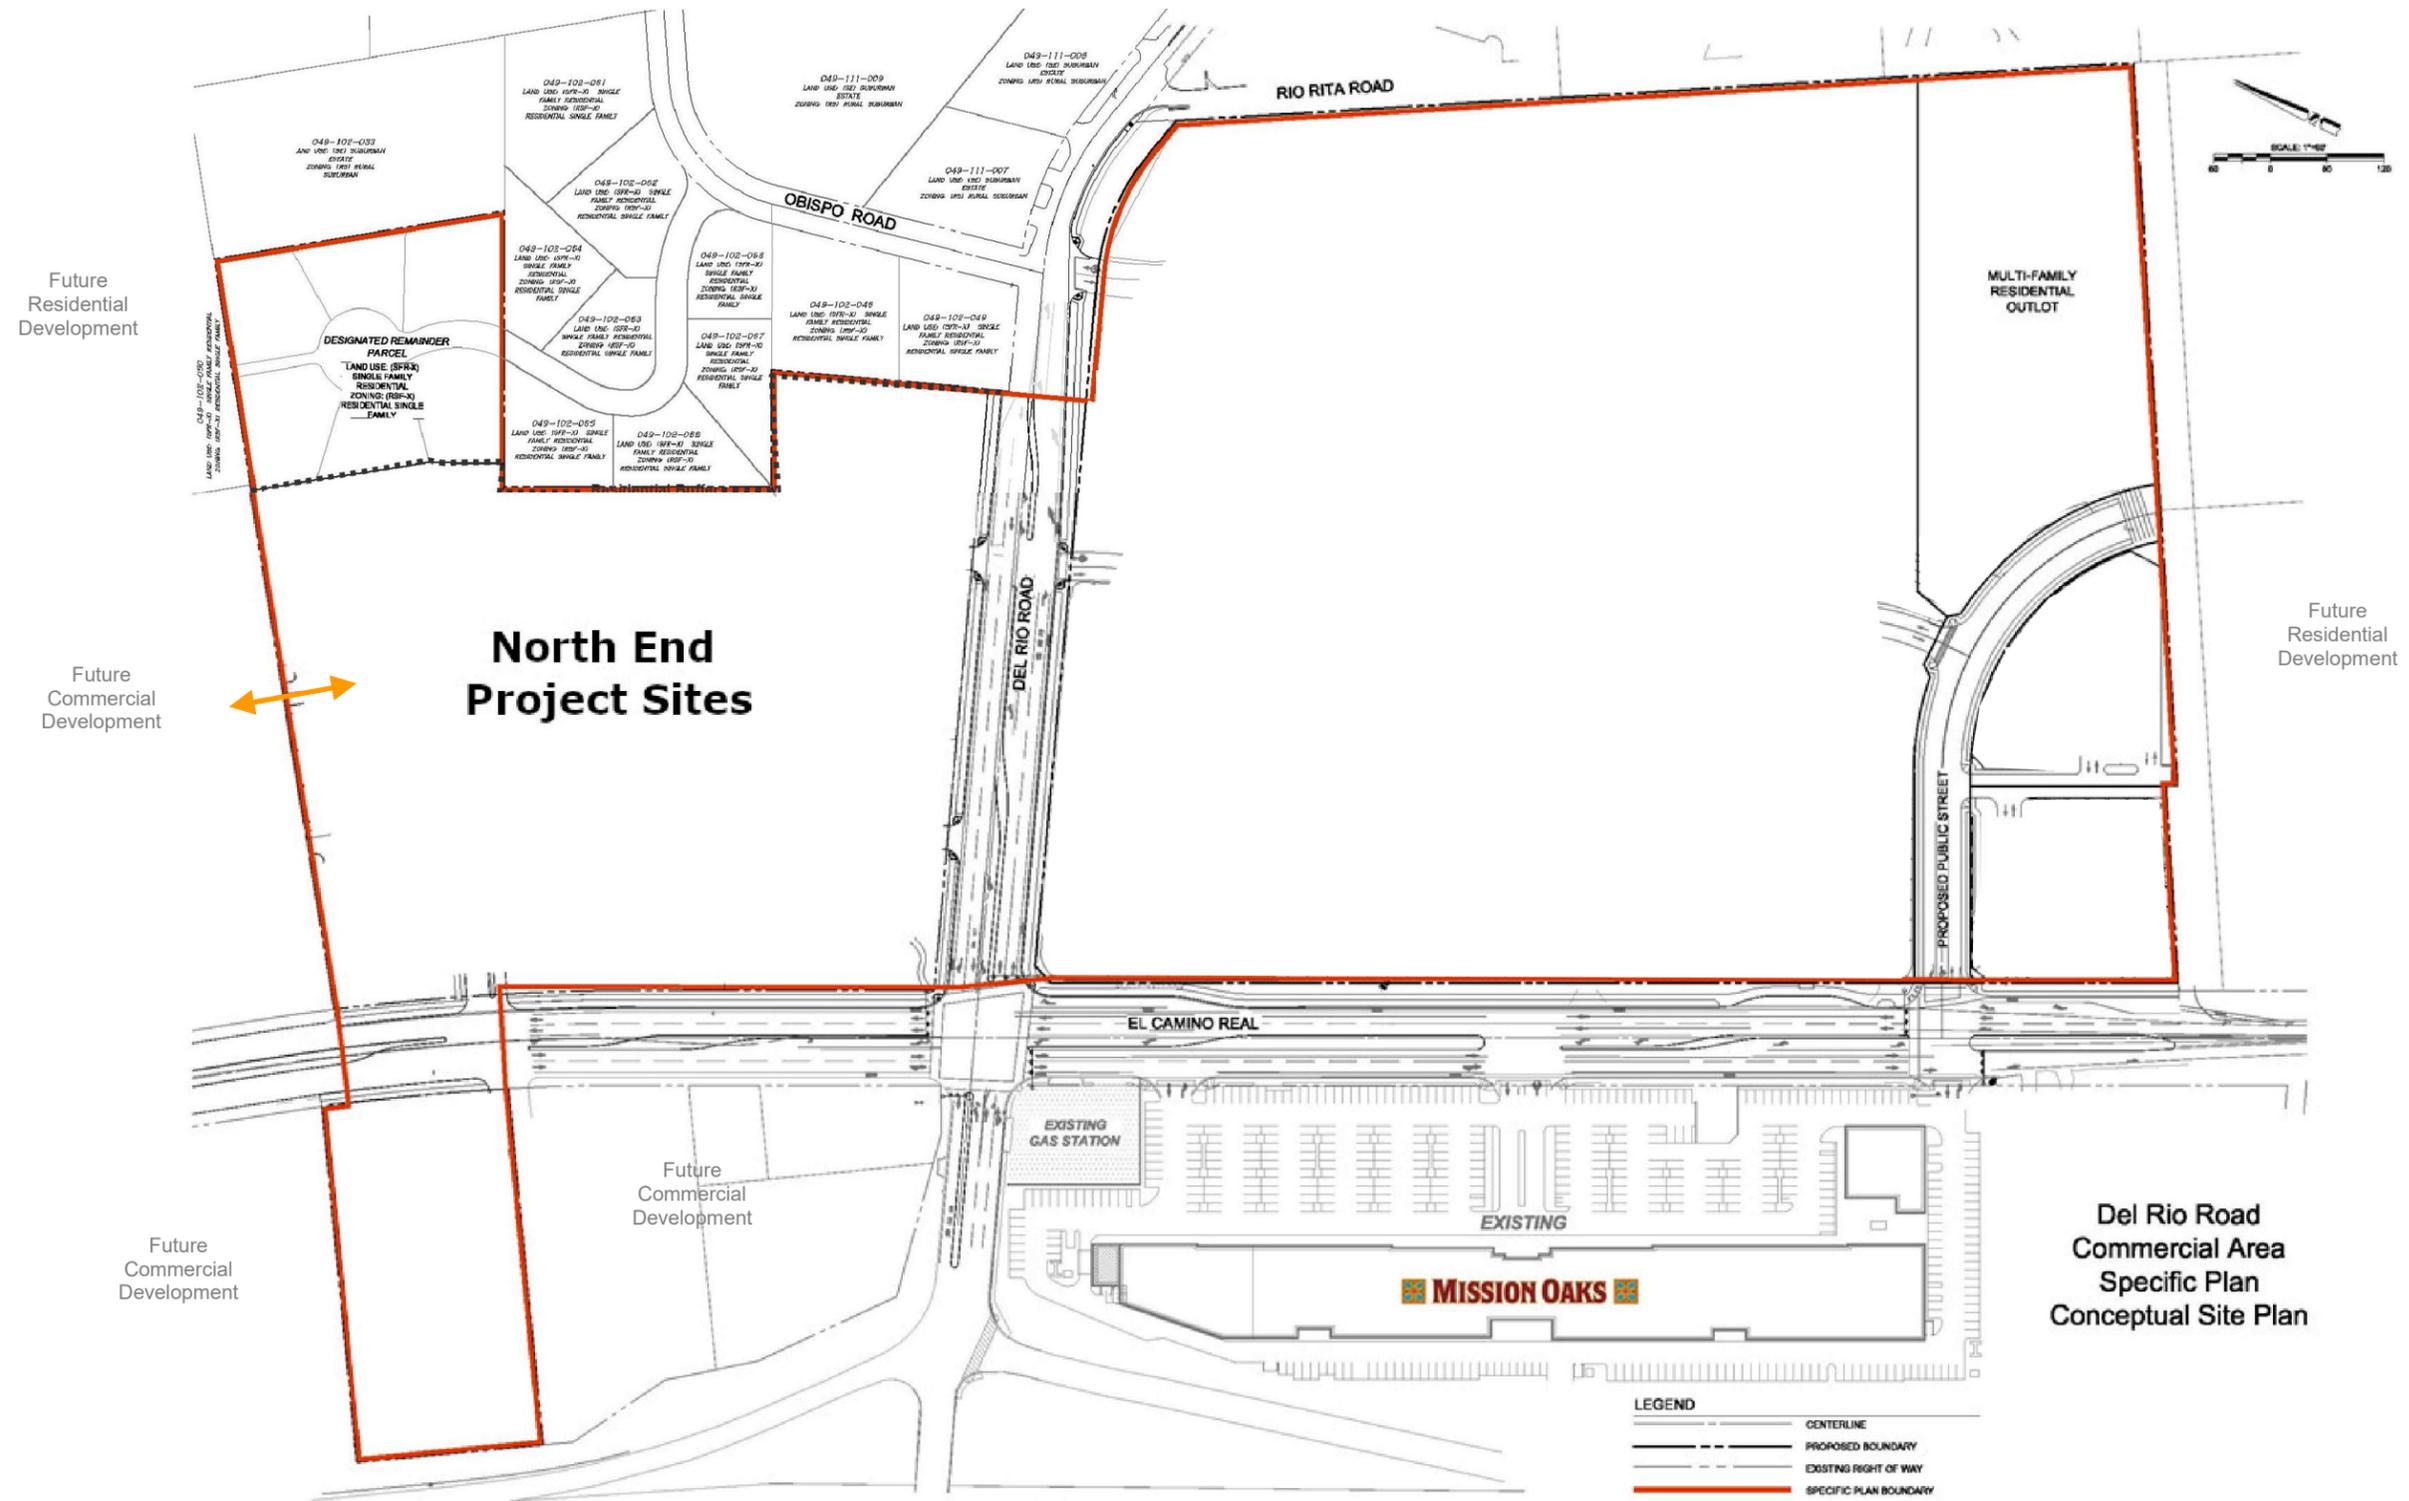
Del Rio Road Commercial Area Specific Plan Conceptual Land Use Plan
